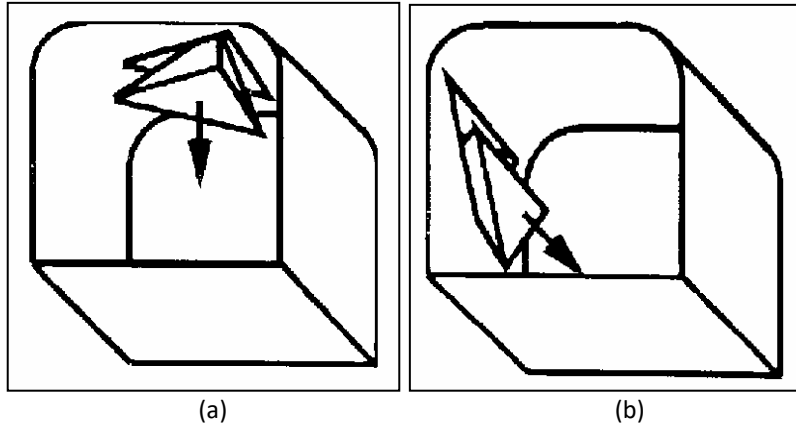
simplified description of the various types of failure which are commonly observed in underground openings excavated in deep, high stressed, massive with few joints, and jointed rock masses (*WSN's Ground Support Manual*).
